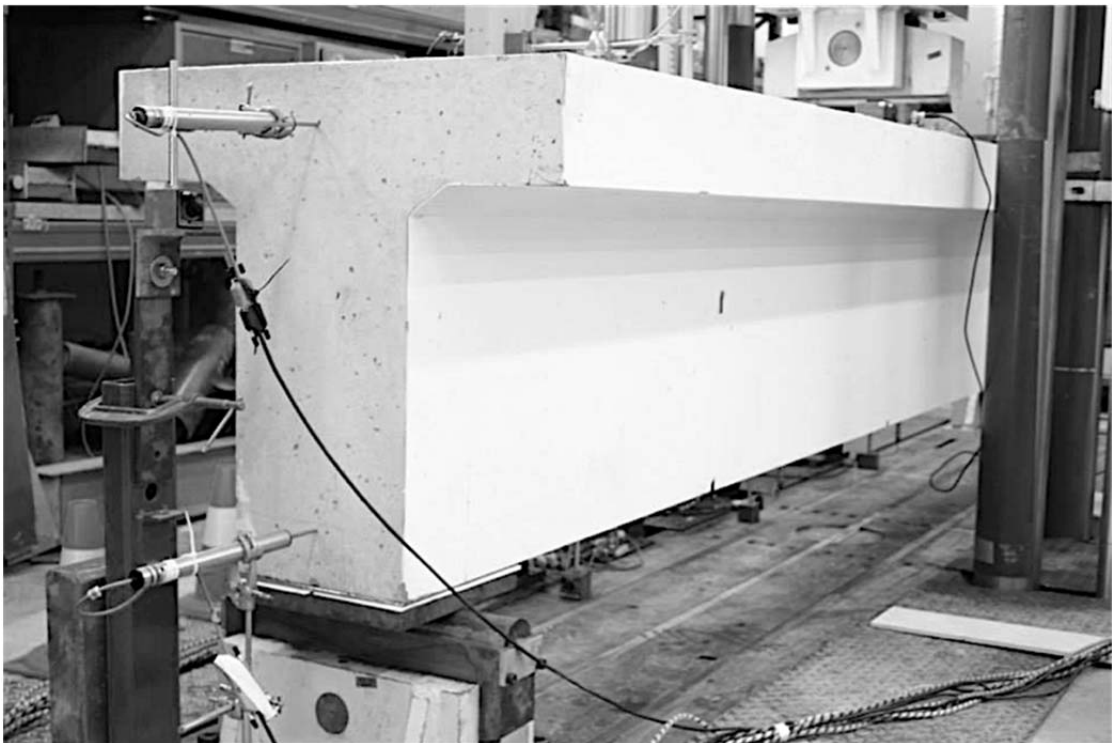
Large T-beam test setup: T-beam in the test rig prior to testing.
